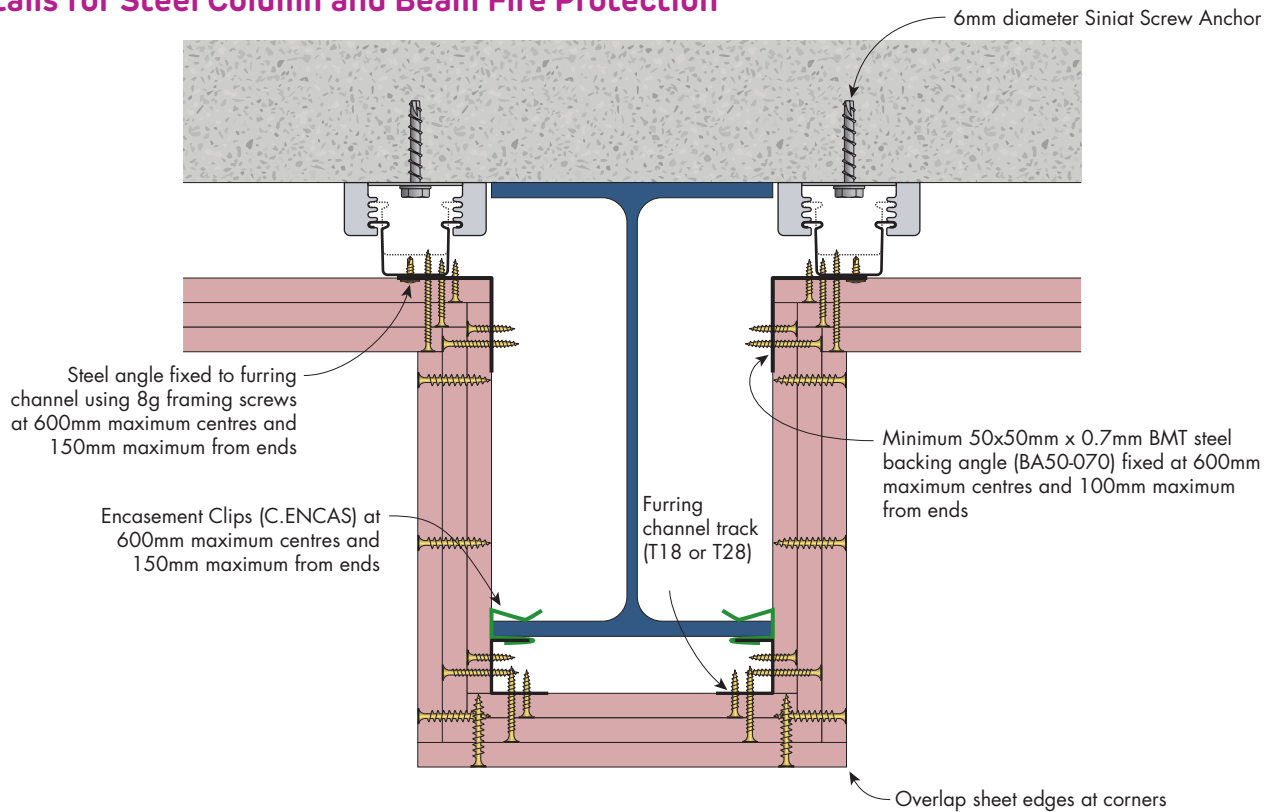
4 Sided Protection for I-Beam/Column
